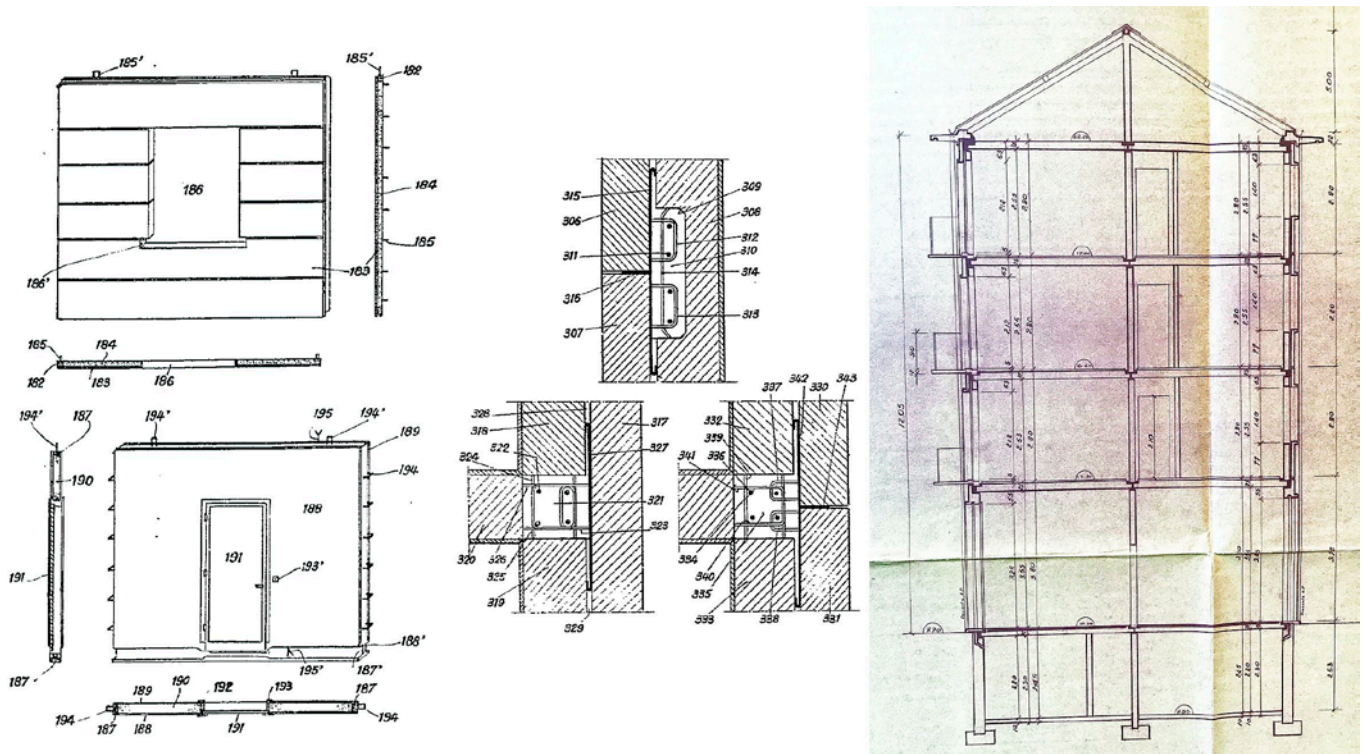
Left: drawings from Raymond Camus's first patent: façade and partition panels; horizontal cross-sections of the façade panels. Right: a transverse cross-section of residential Building A, Camus's first project in Le Havre. The drawings show that the façade is assembled from two rows of panels. Source: Patent N 1.009.676, requested on 16 June 1948, delivered on 12 March 1952. AMH, Fonds contemporain, demande de permis de construire, PC 587/49.
